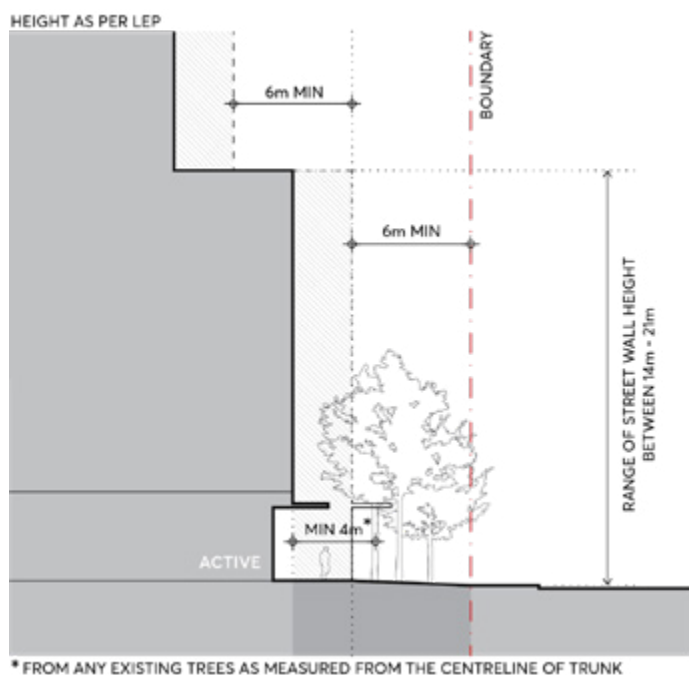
Great Western Highway (Section C) Setbacks and Street Wall Height
